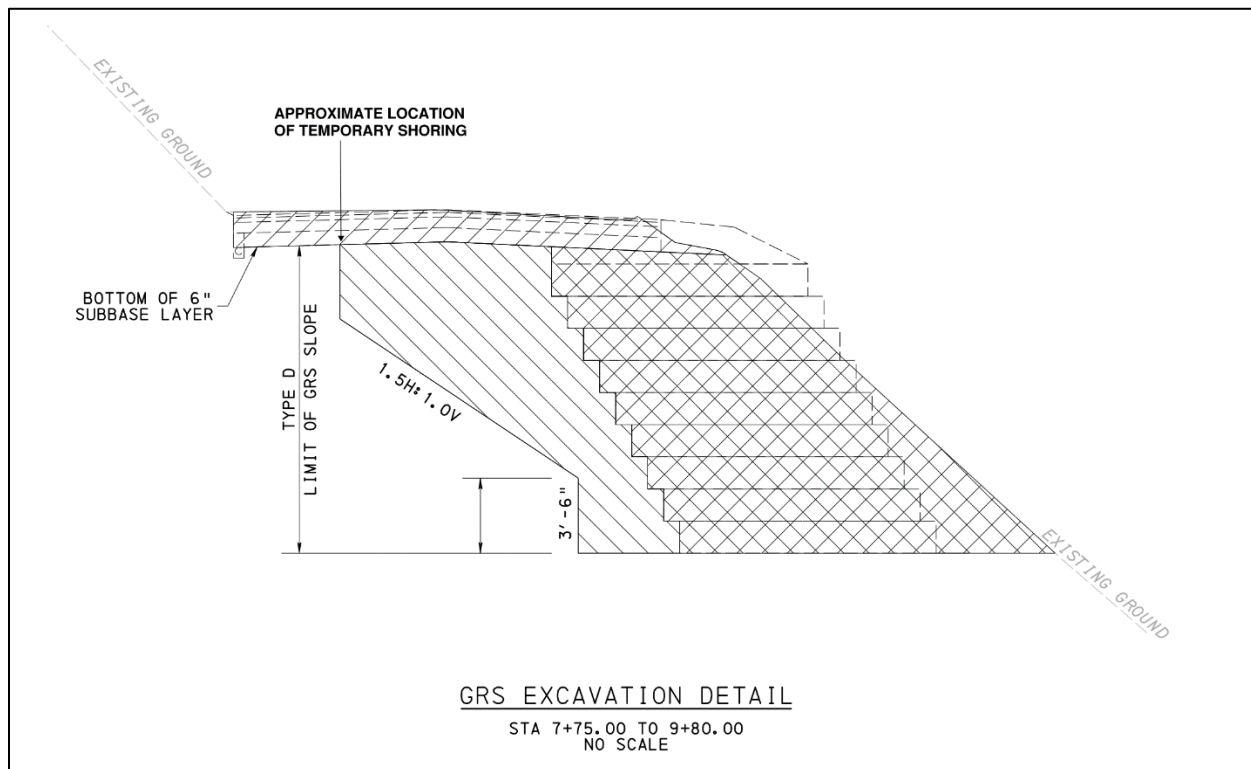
GRS Excavation Detail with Temporary Shoring
